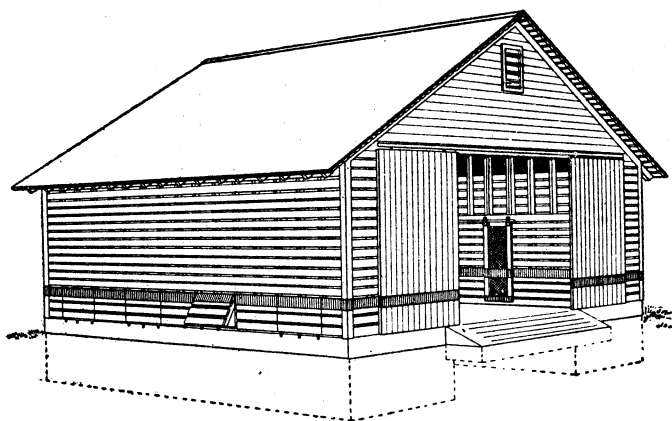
Perspective of rat-proof corner crib, showing concrete foundation by dotted lines; also belt of metal.
